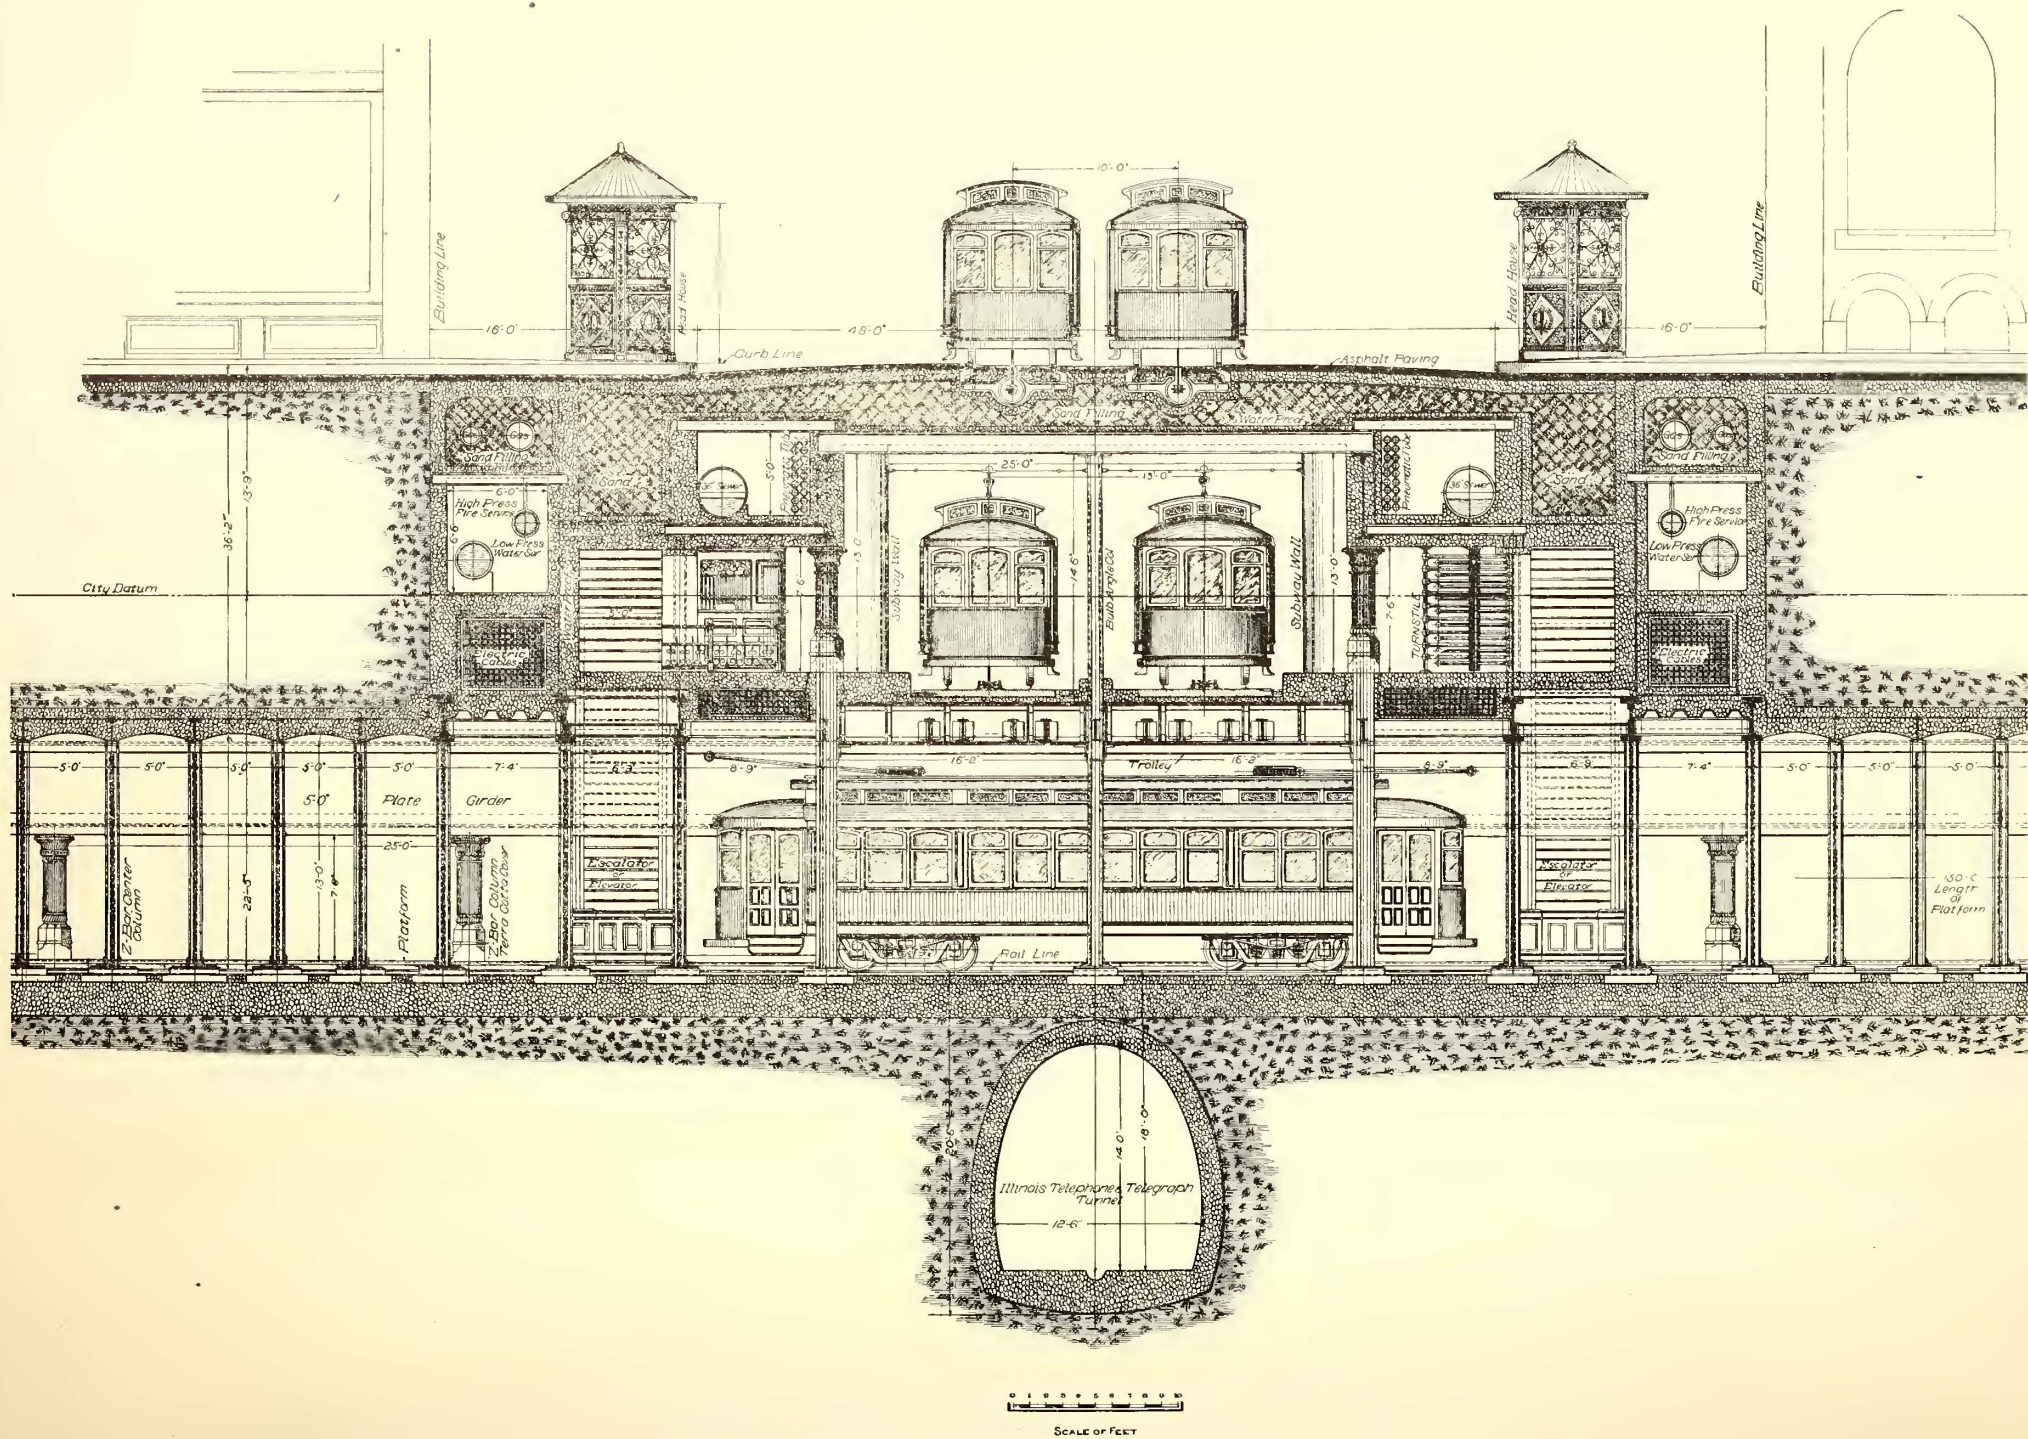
TYPICAL SECTION SHOWING STATIONS AT INTERSECTIONS OF HIGH AND LOW LEVEL SUBWAYS
